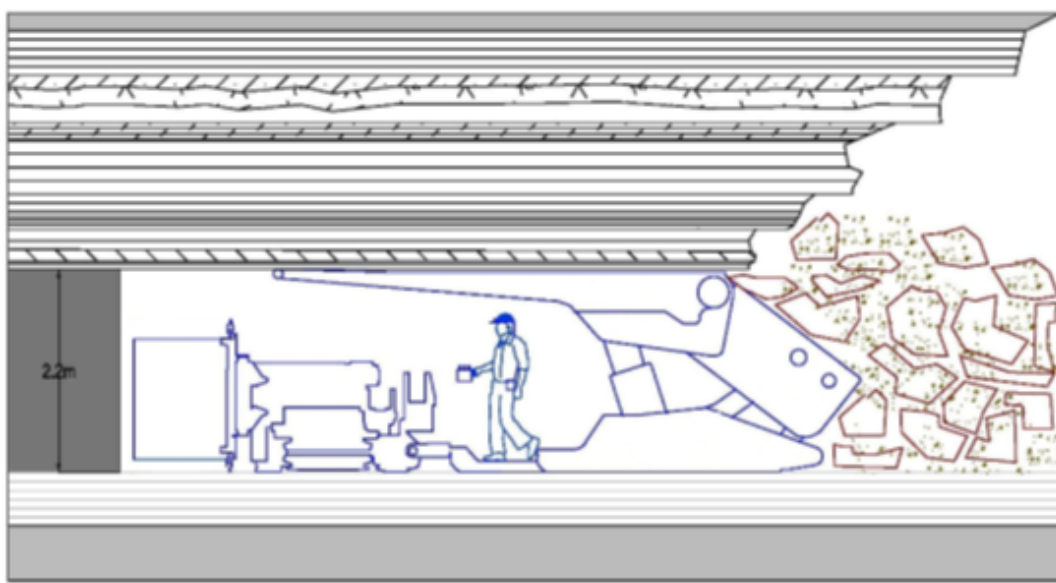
Cross-section showing a typical longwall at the coal face
